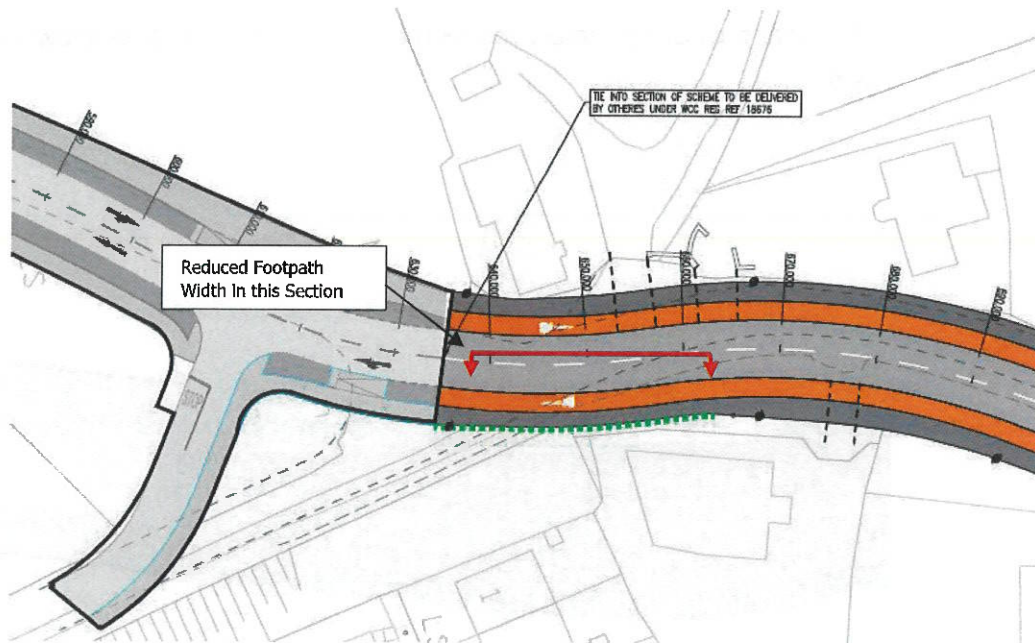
Section 2 Design Proposals to tie in with the New Chapel Road Alignment
